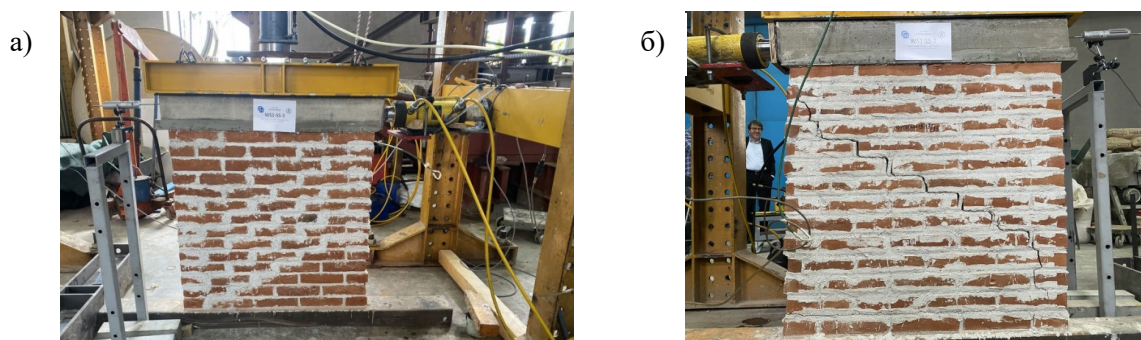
Testing of shear strength of masonry, a) Initial stage b) Failure mechanism
